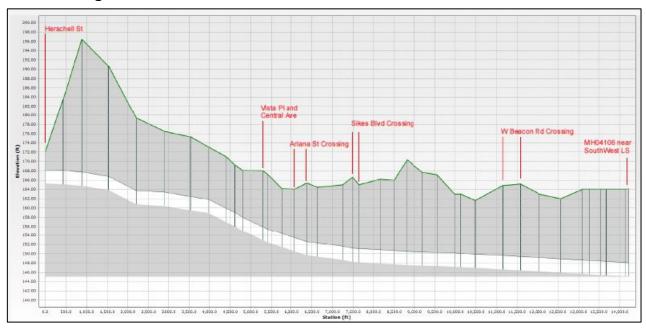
Alternative 3 – Pinewood/Forest Park/Webster Route
